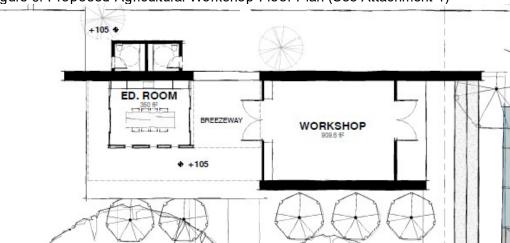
Proposed Agricultural Workshop Floor Plan (See Attachment 1)
